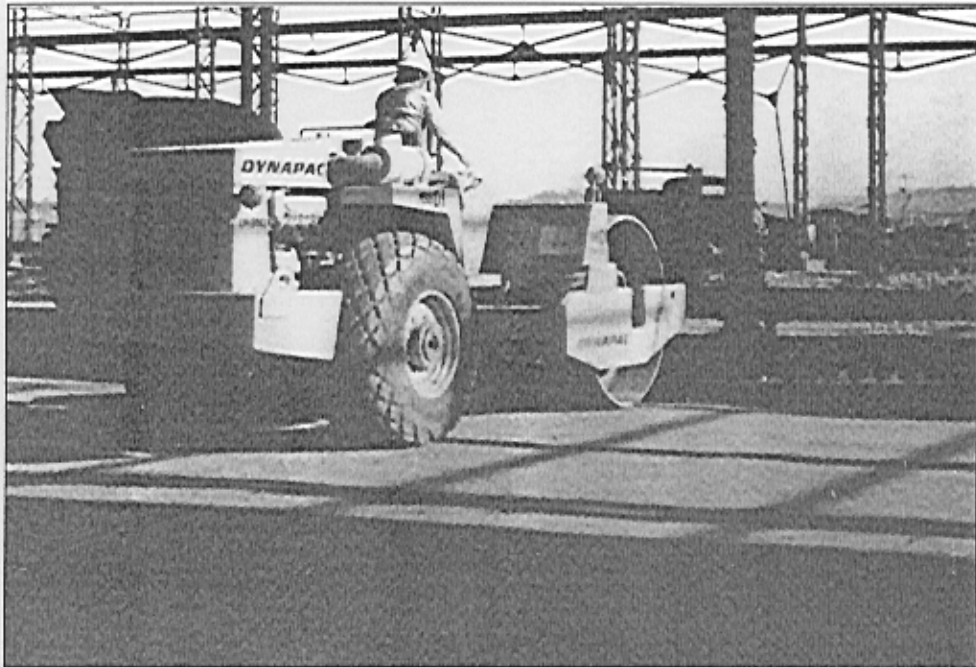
RCC USED FOR THE SUBFLOOR OF THE WAREHOUSE AT ITAIPU JOB SITE(1976)
